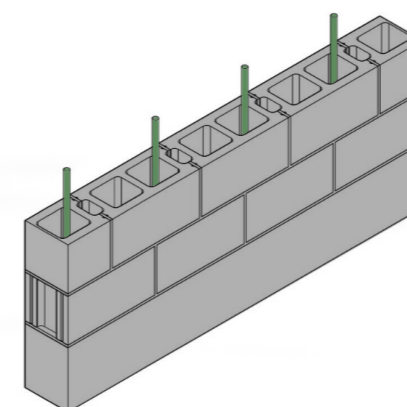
Hollow concrete blocks with rebar reinforcement (adapted from A.J.J. Sparling, 2015)
